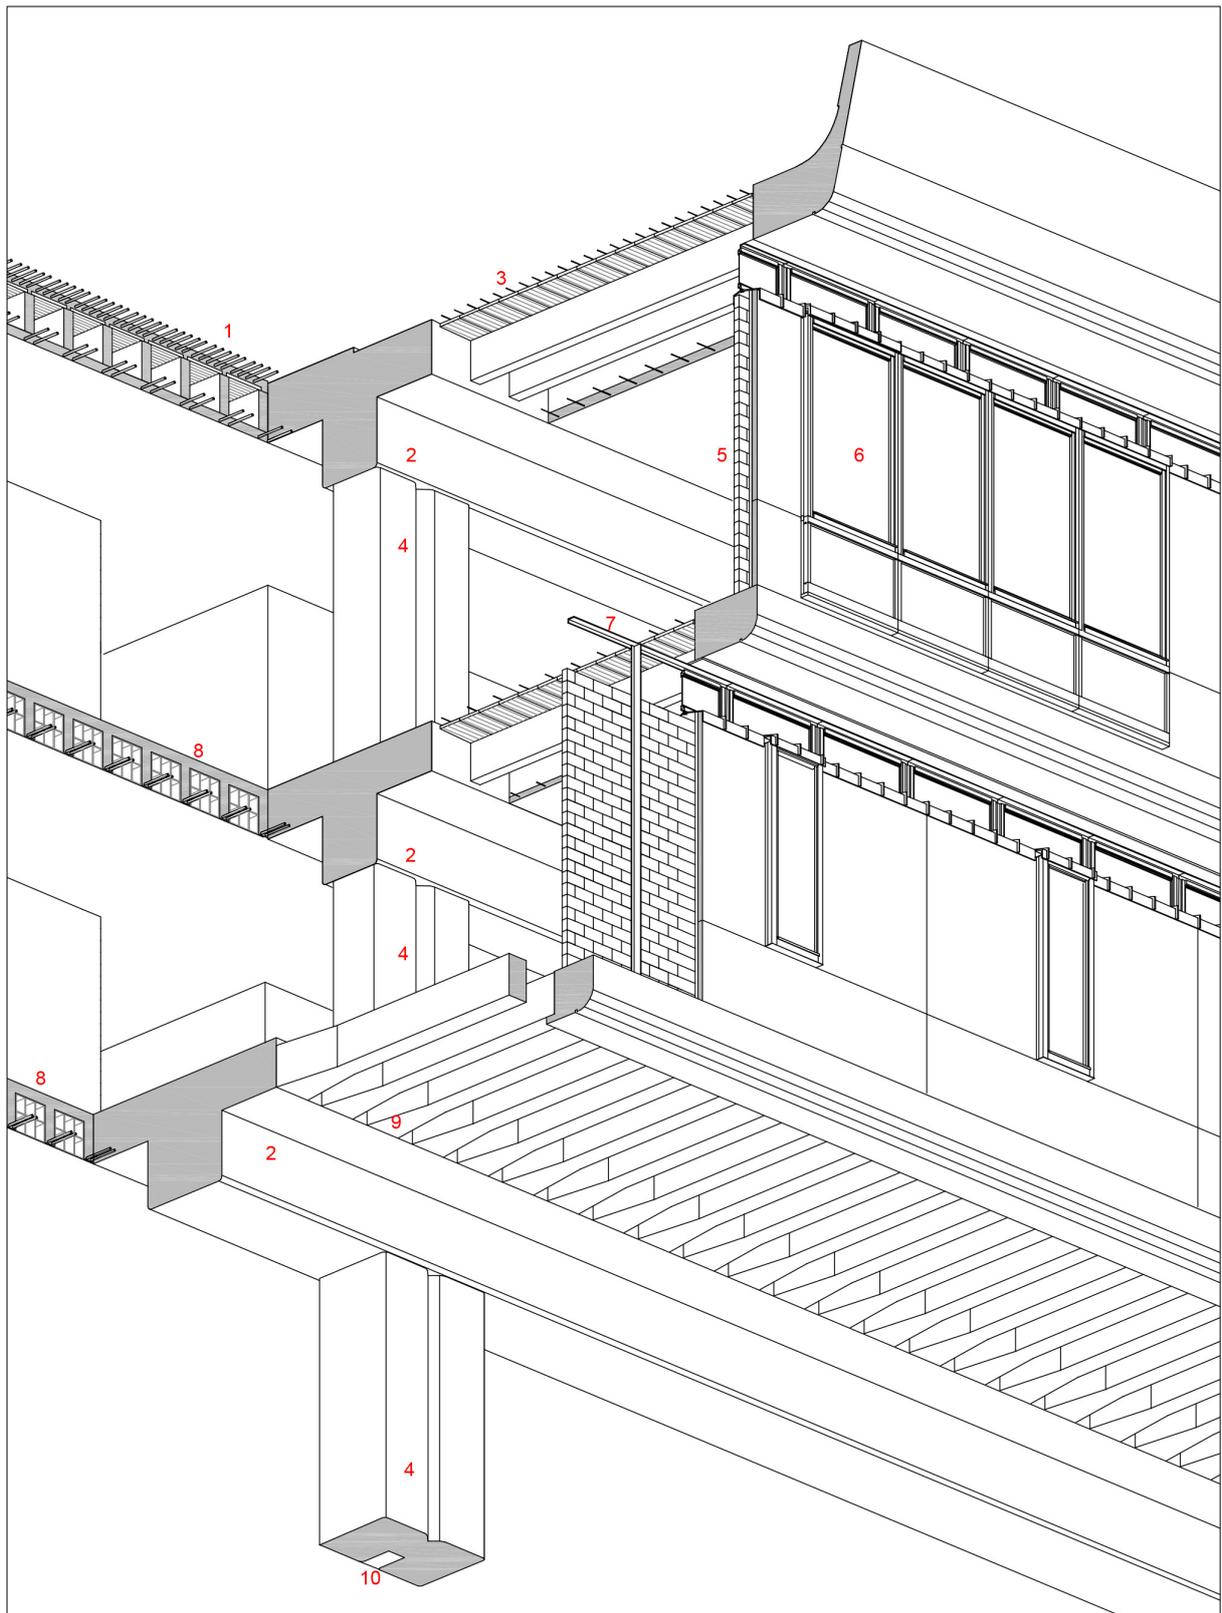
1. reinforced concrete double floor slab, 60 cm; 2. "T"-shaped beam in reinforced concrete;
